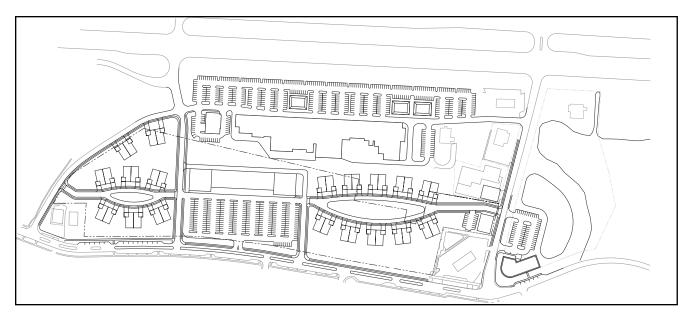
Alternative Site Layout B - Lower Density Layout
